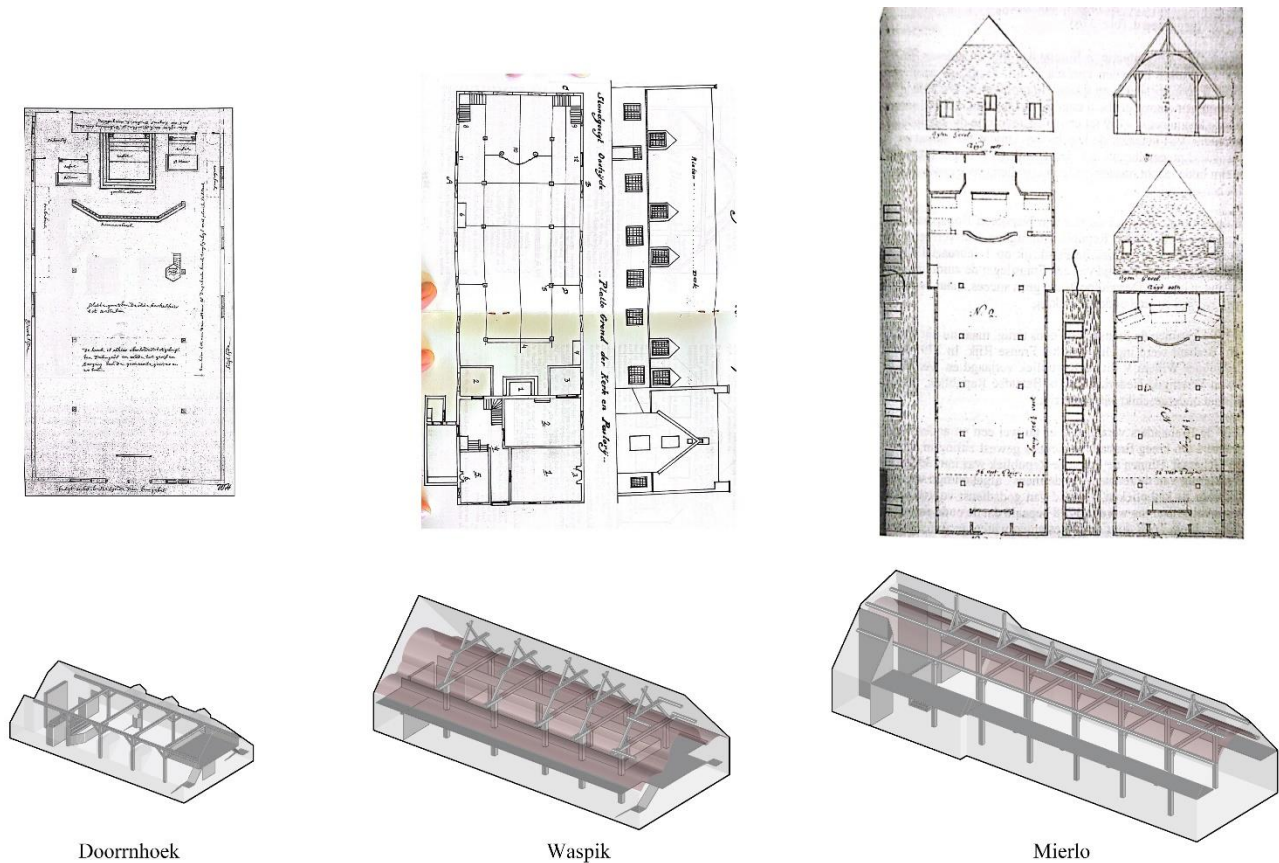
The floorplan and axon view of three typical schuurkerken. (Plan: het Nationaal Archief in Den Haag.)
